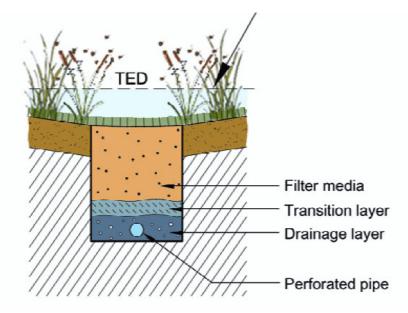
Typical Biofiltration Swale Detail (Source: WSUD Engineering Procedures for Stormwater Management in Southern Tasmania 2005)
